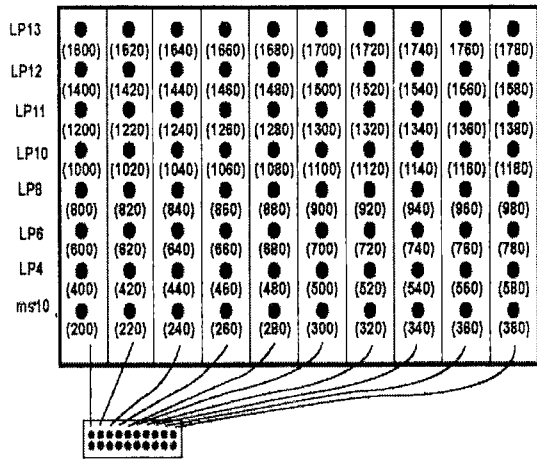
8-row shot with the sequential blasting machine(80 holes)
